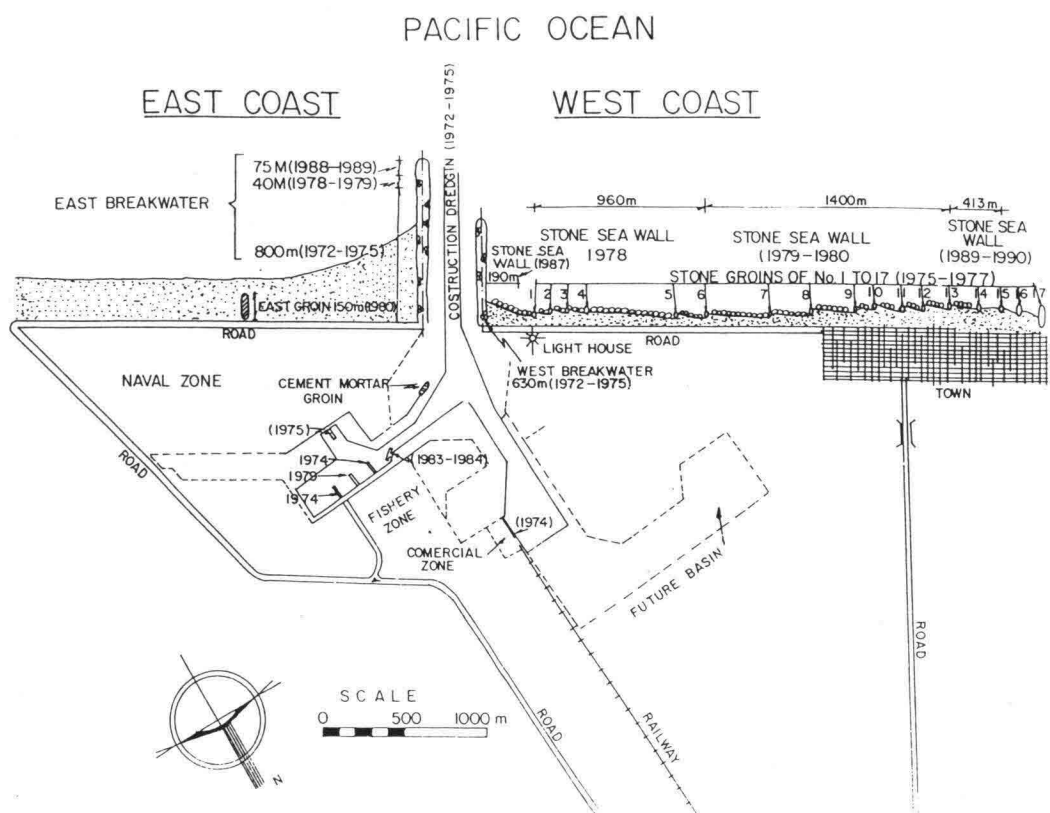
Plan of the port at present with the periods of the construction of structures
